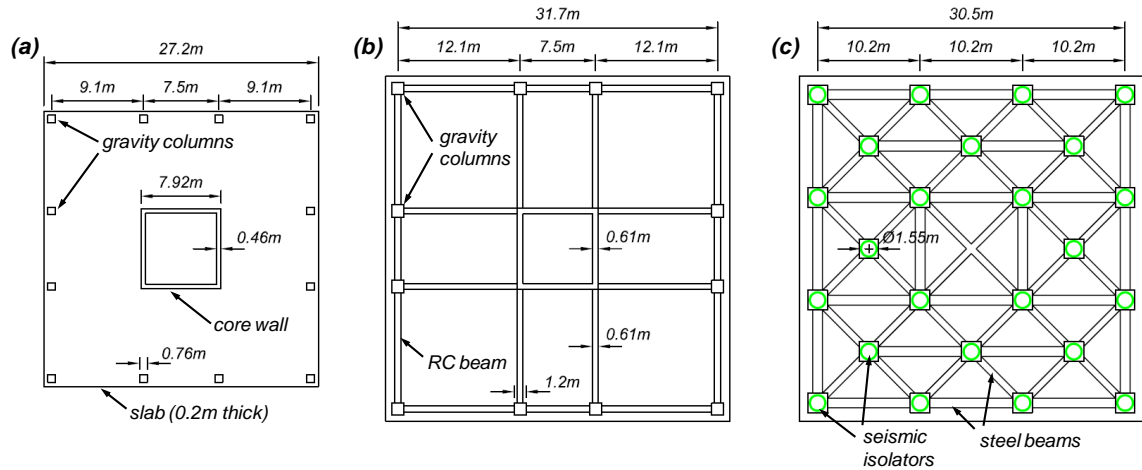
Plan view of: (a) floor above ground, (b) floor below ground, and (c) isolation plane.
